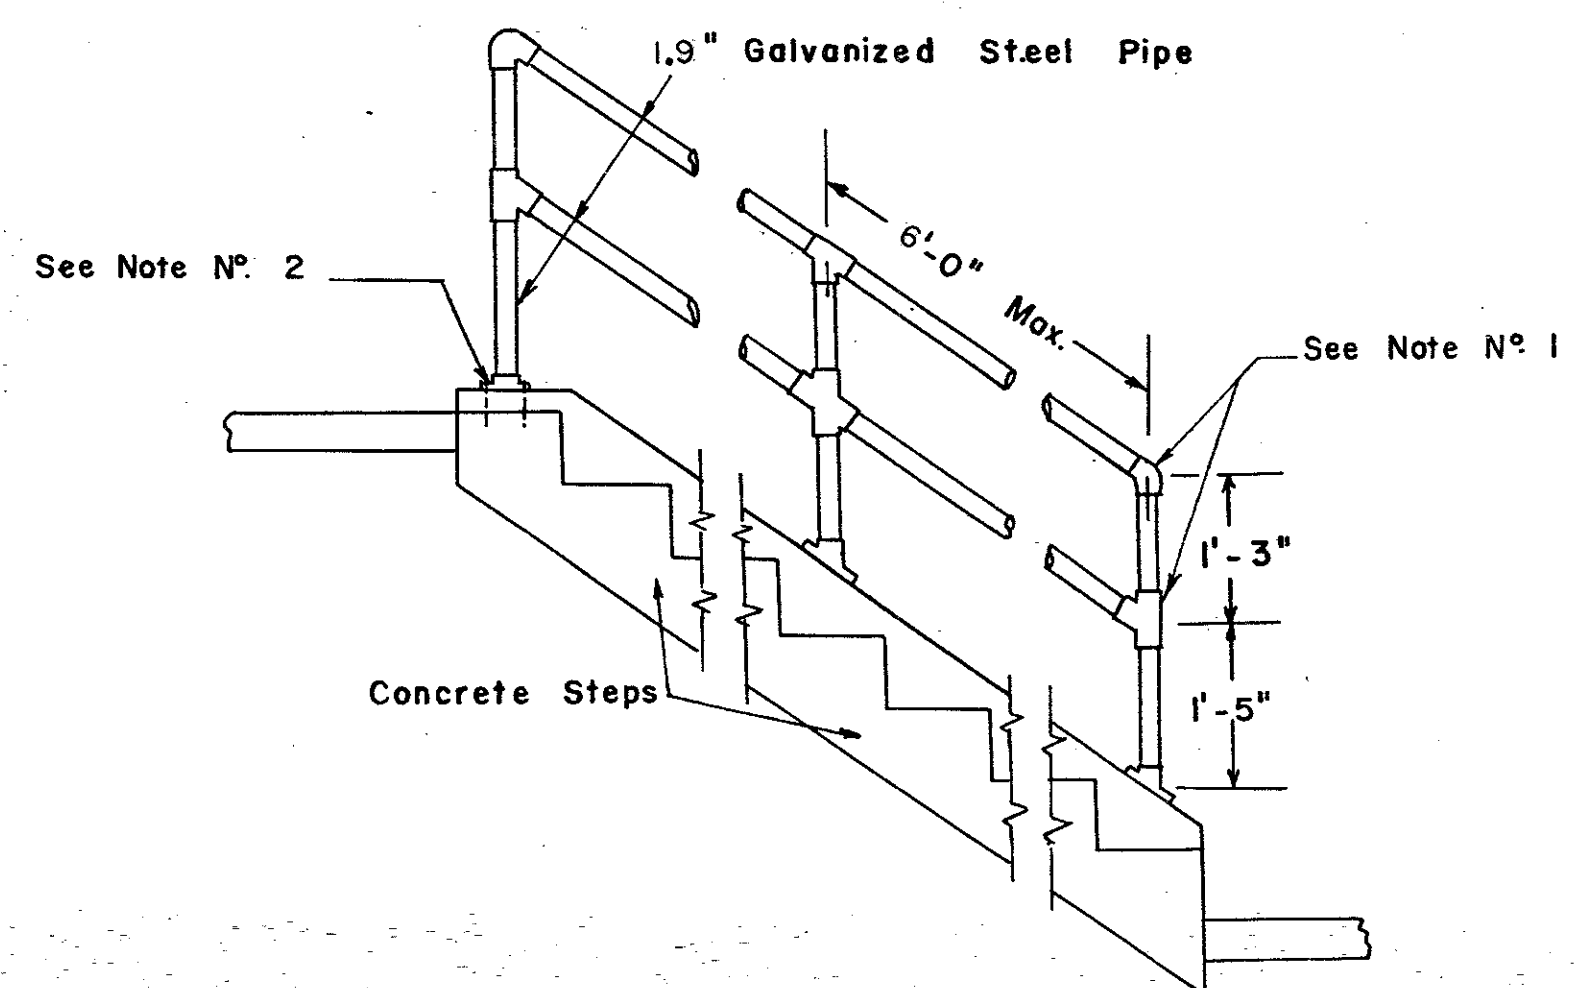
DETAIL OF PIPE HANDRAIL FOR RETAINING WALL
